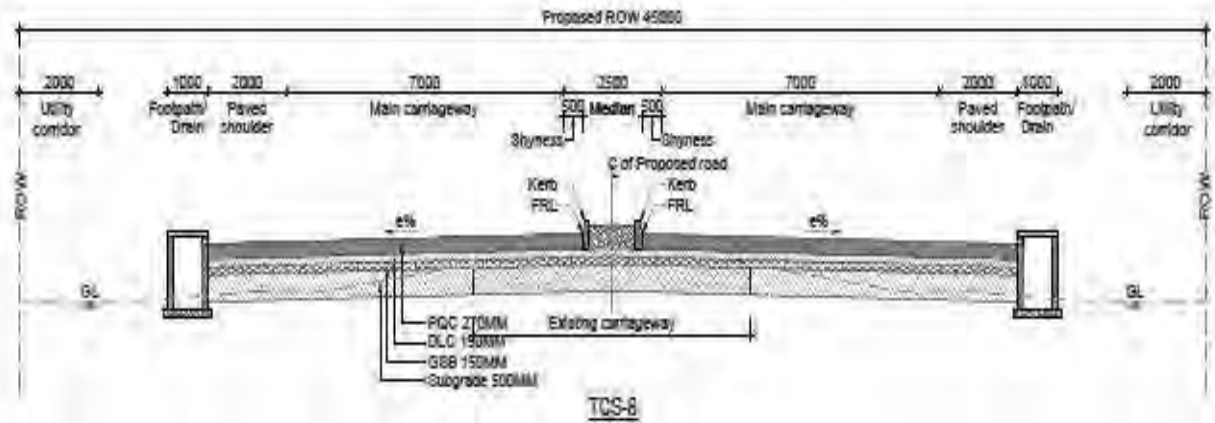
TCS-8 Typical cross section of 4-laning by concentric widening With 1.5m raised median for restricted row
